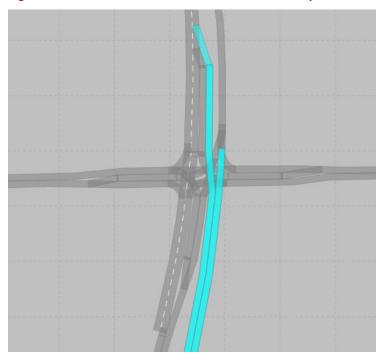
depicts the geometry of how the BRT Build Alternative would transition out of the roundabout into the Muir Woods Station. Only northbound BRT vehicles would stop at this station before continuing north utilizing the internal Muir Woods roadway network to traverse through the second roundabout in order to head south.
